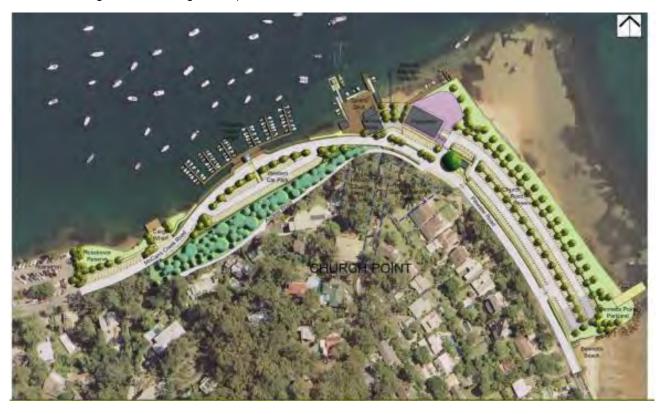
Church Point Masterplan (from Church Point Plan of Management, 2009)
